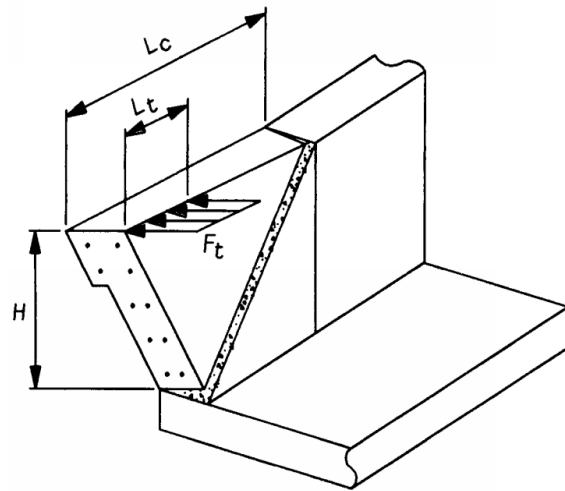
Illustration of design parameters using yield line analysis of concrete parapet walls for impact near end of wall segment (AASHTO LRFD Figure CA13.3.1-2)
